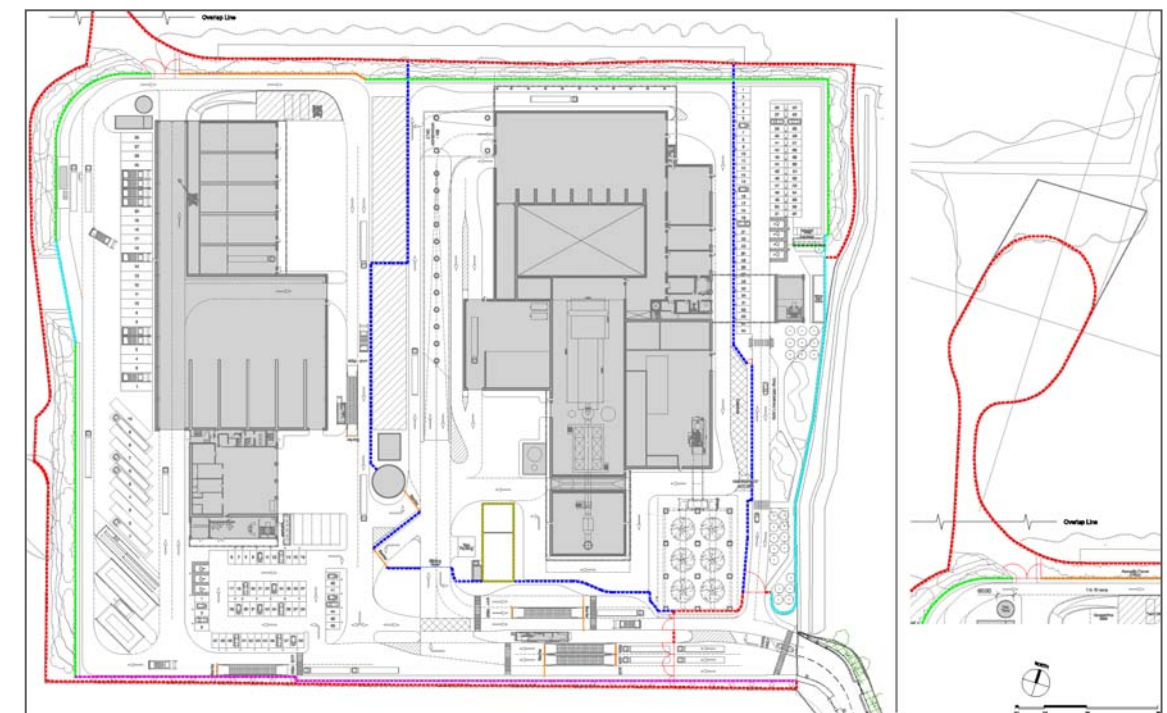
Proposed fencing layout – extract from drawing PL108
